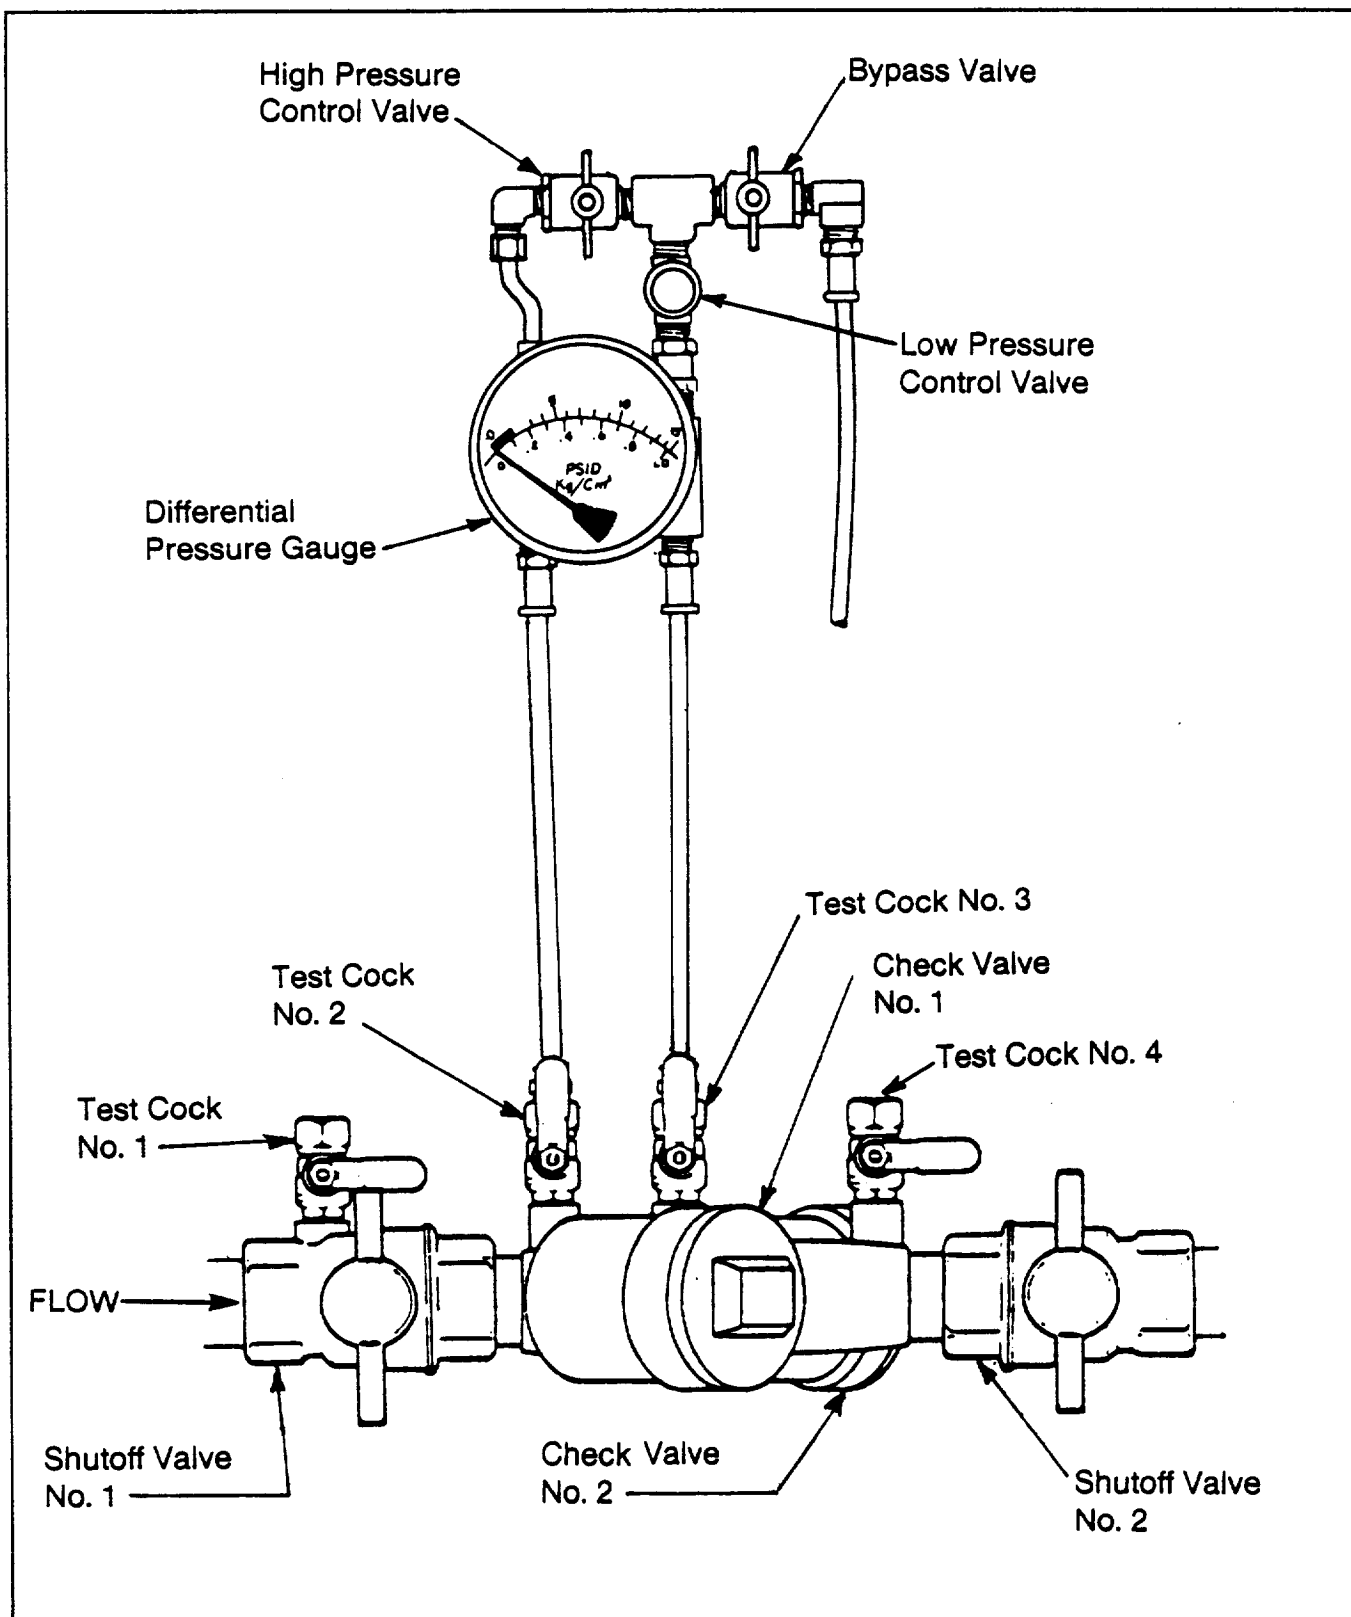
Setup For Testing Double Check Valve Assembly Using Differential Pressure Gauge.
